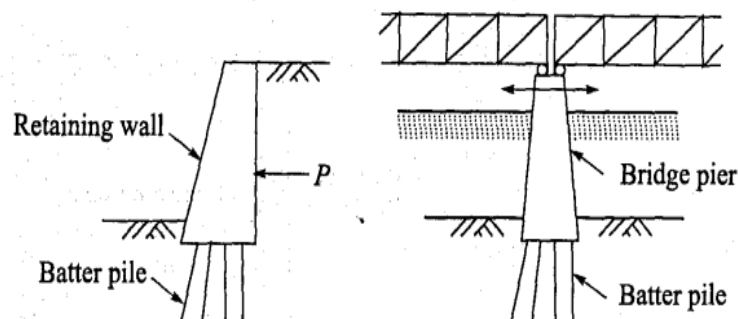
11 Piles used to resist lateral loads (Source: V.N.S Murthy, 2007)
